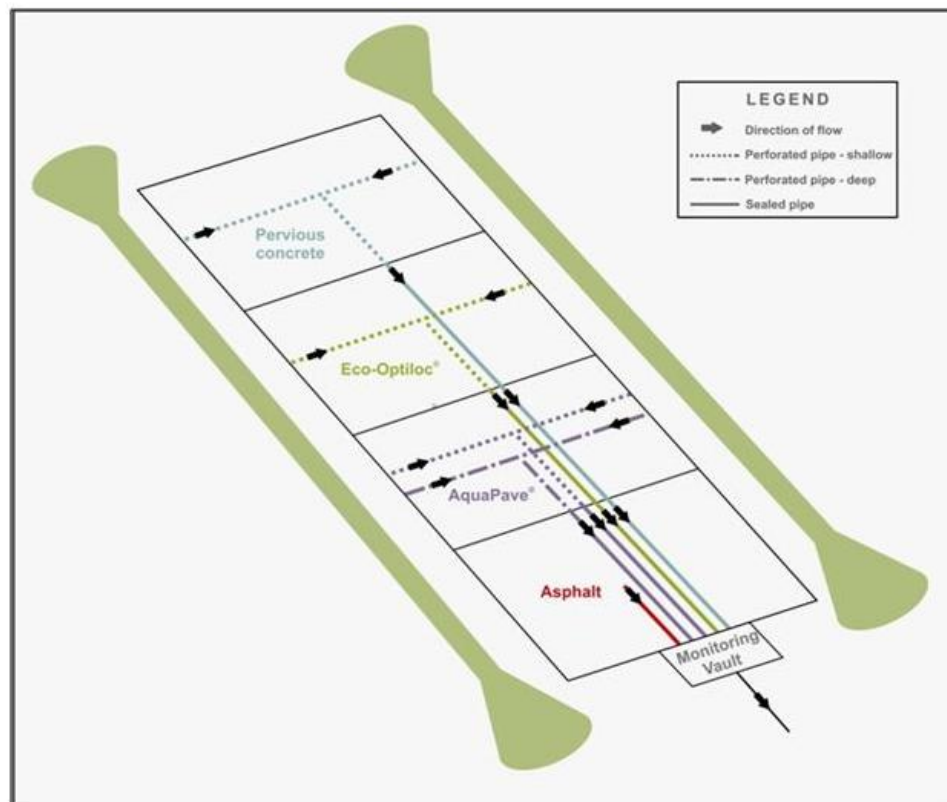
Schematic of Kortright permeable pavement showing the monitoring vault and location of perforated underdrains and sealed pipes.
